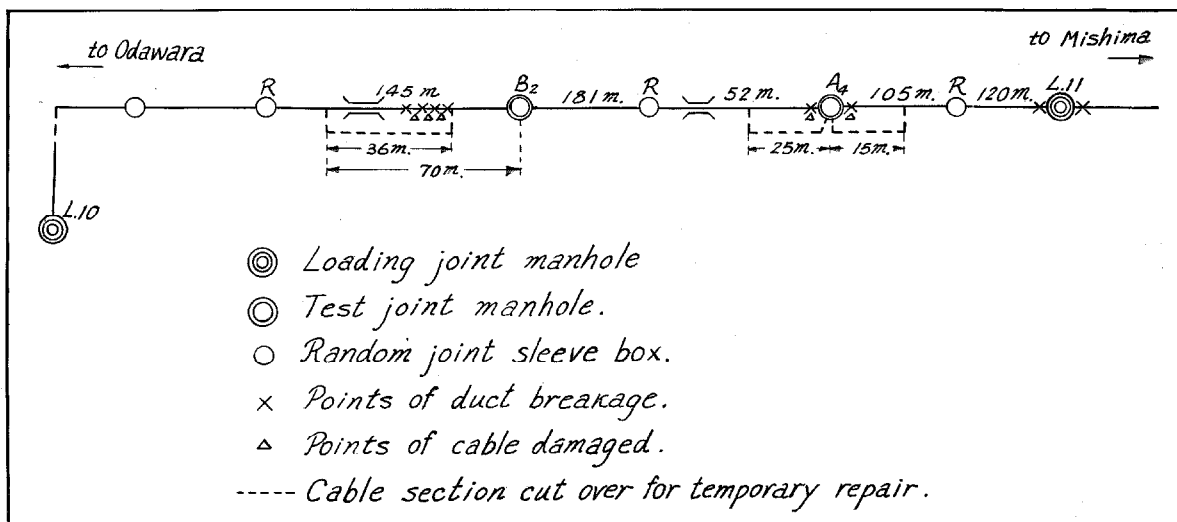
The Section in Which the Underground Telephone Cable Sustained Heavy Damages.
